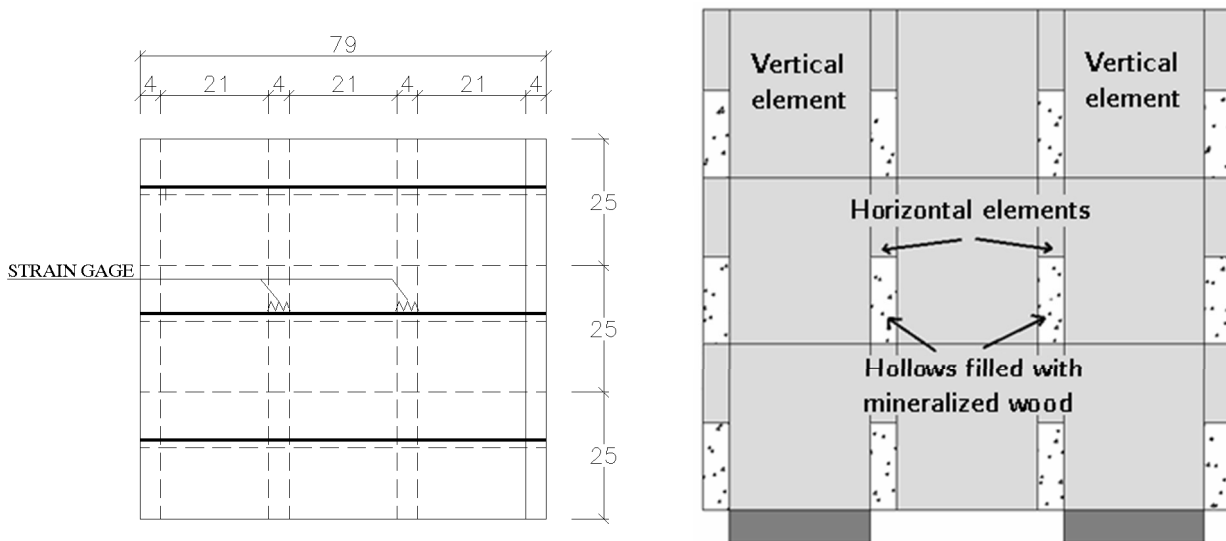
Strain gauge position (left) and internal concrete structure of specimens (right)
